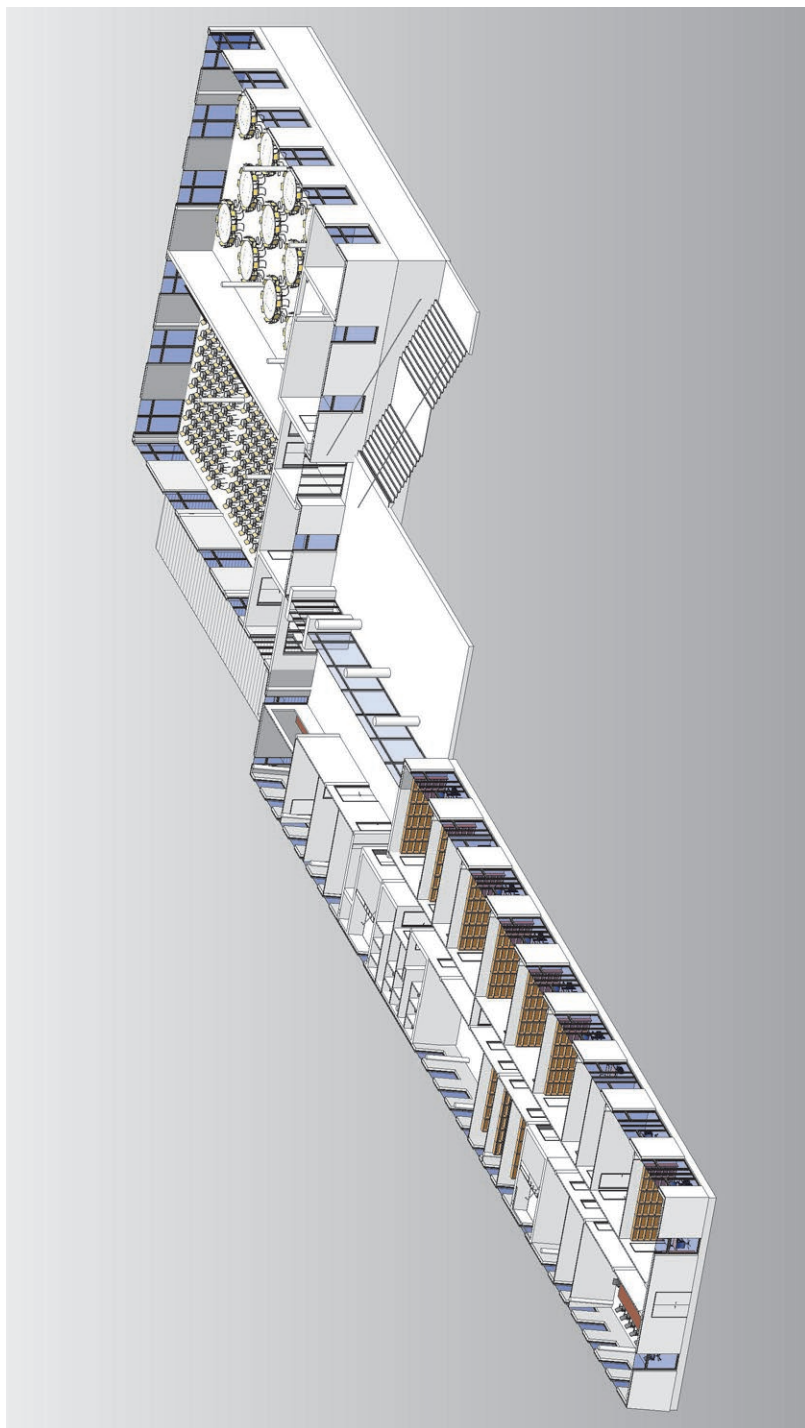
Axonometric view of the New Generation Office Building's ground floor
